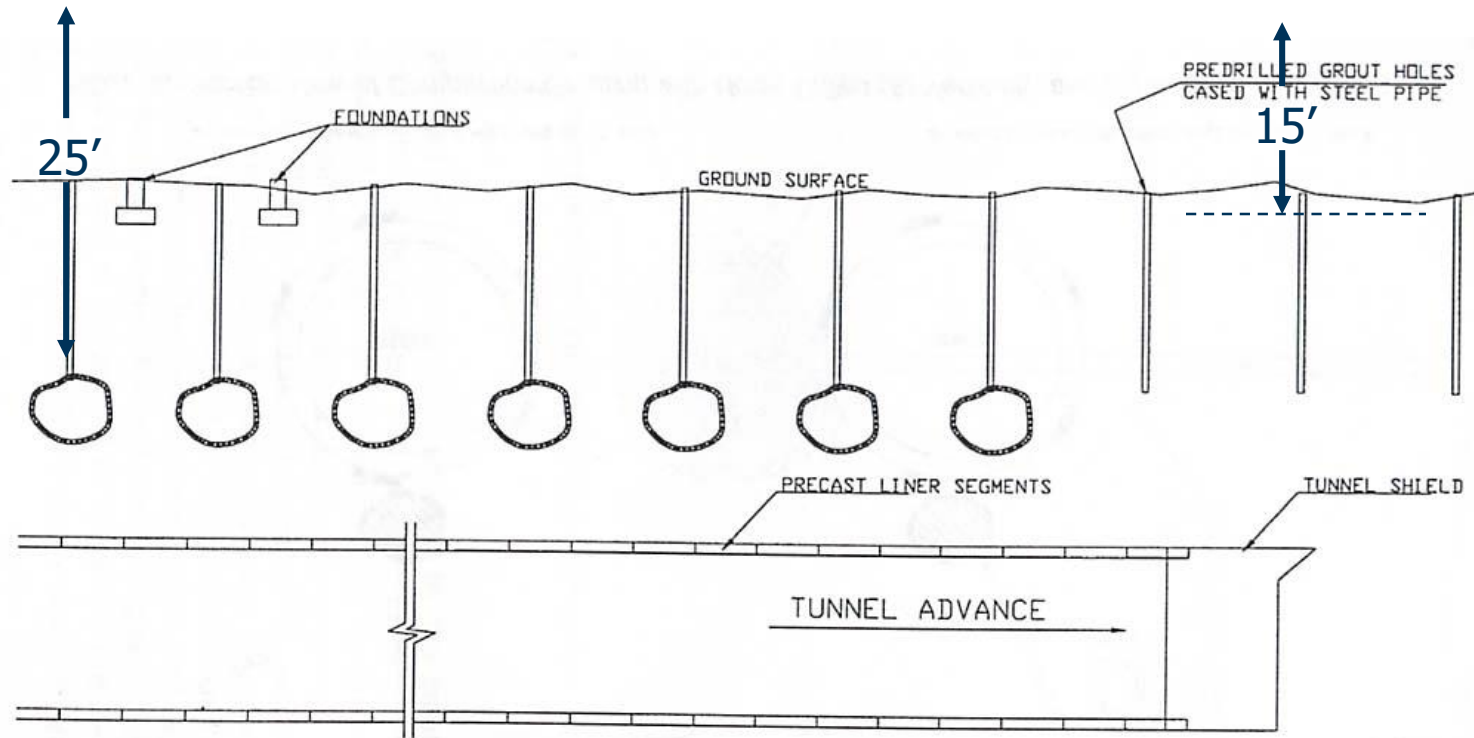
from *Practical View of Tunneling*, Grouting underground structures, used with permission of Soft-Ground Tunnel
